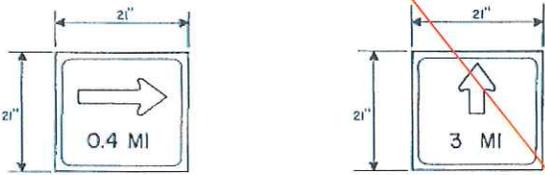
TYPICAL DIRECTION ARROW & MILEAGE DETAIL
